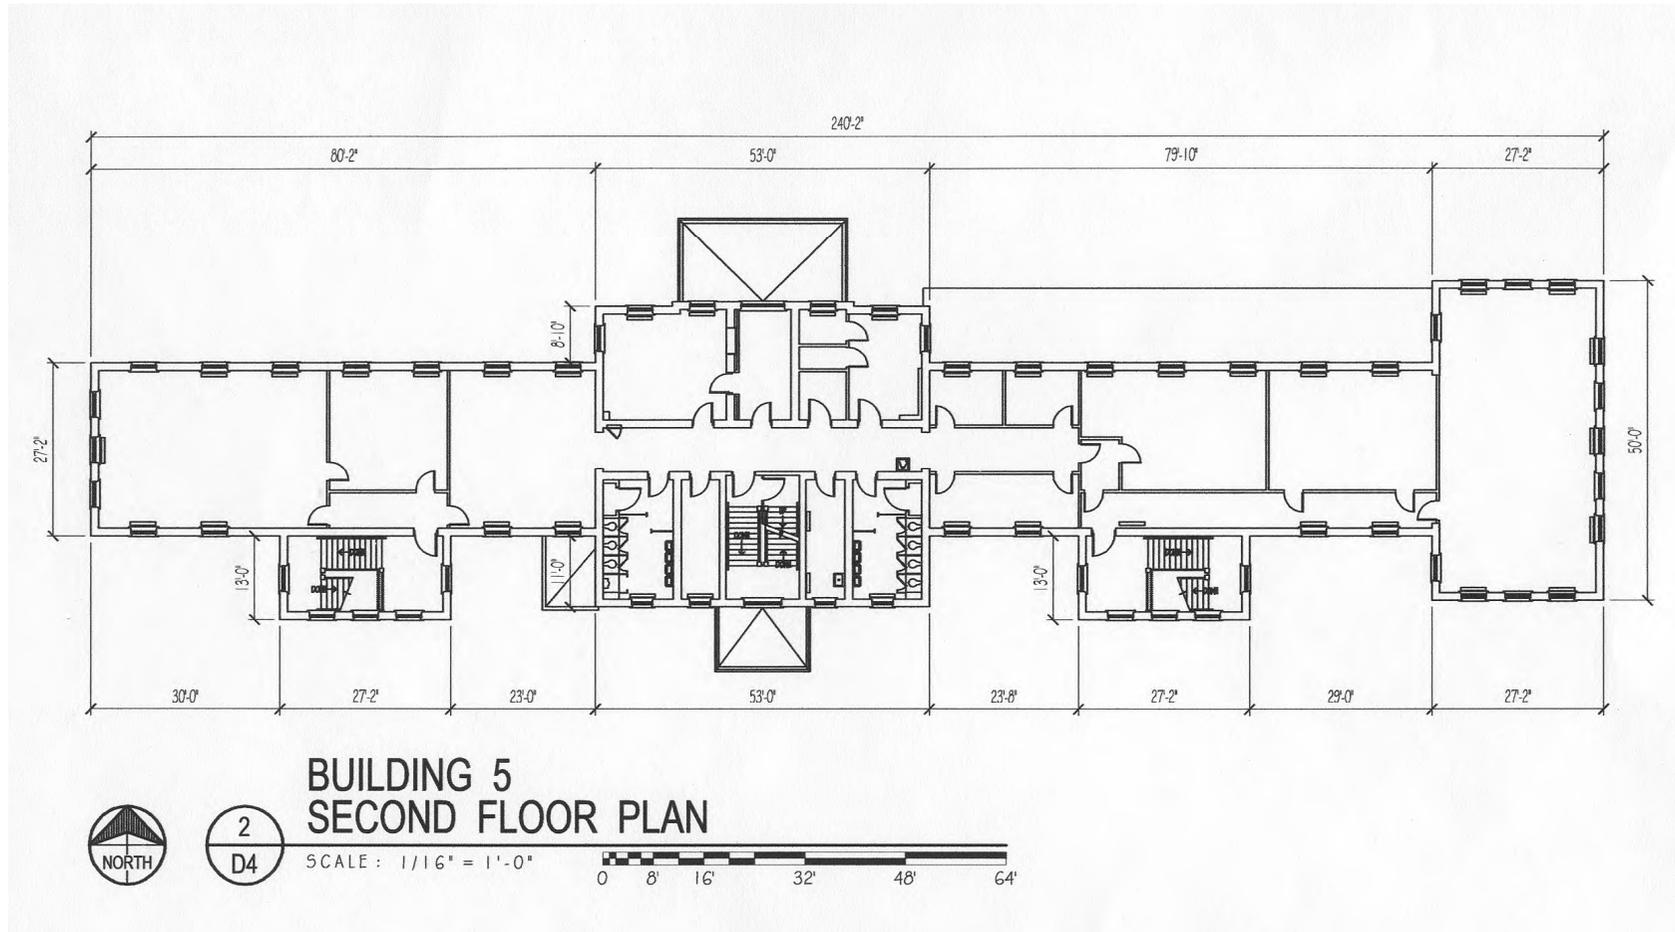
Second floor plan of Building 5 showing existing conditions (Walton and Associates 2003).
